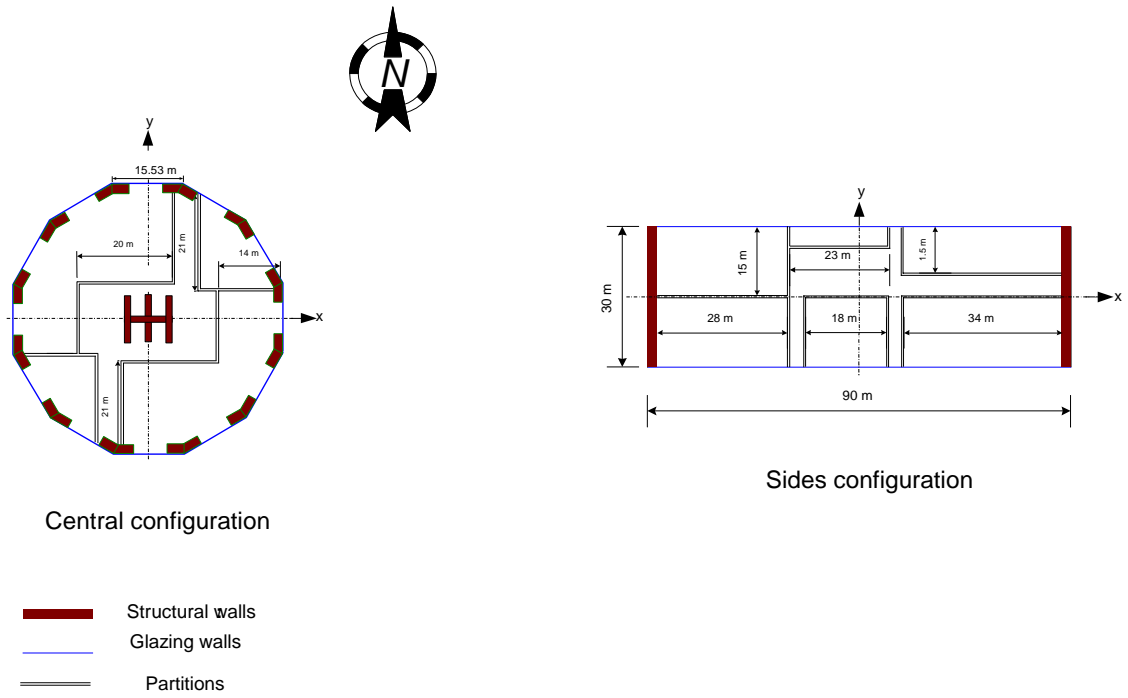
Plan views Central and Sides (thermal mass analysis)
